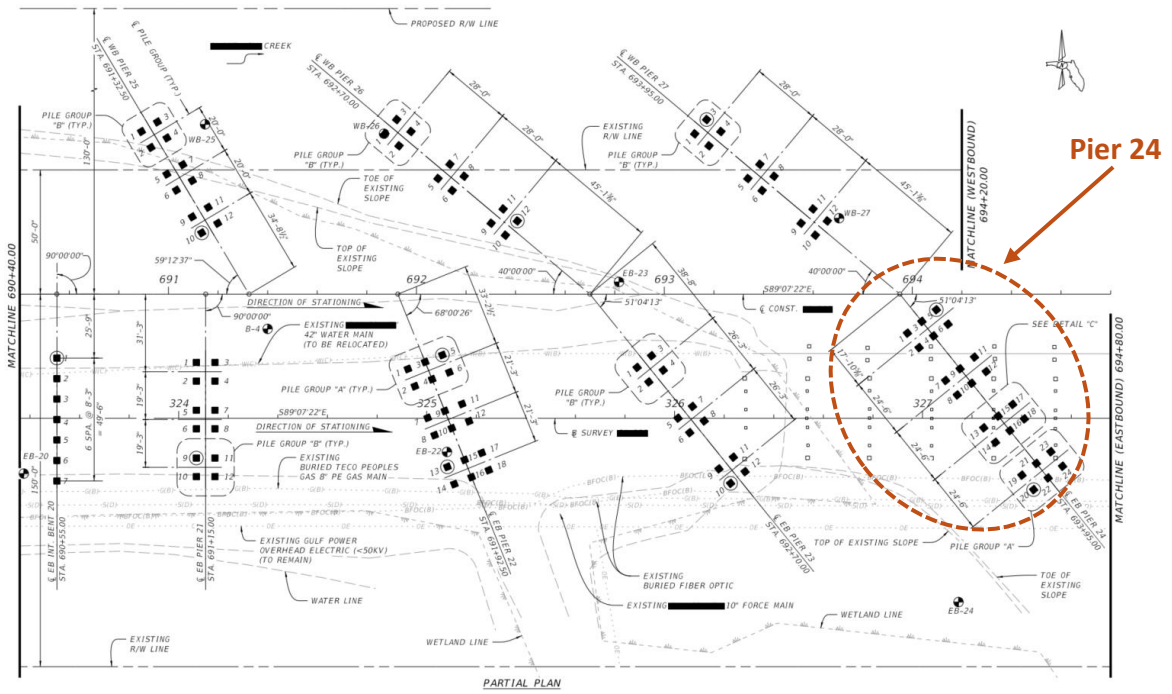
Partial foundation layout plan – Selected Pier no.24 of the Eastbound Bridge (B1-83)
